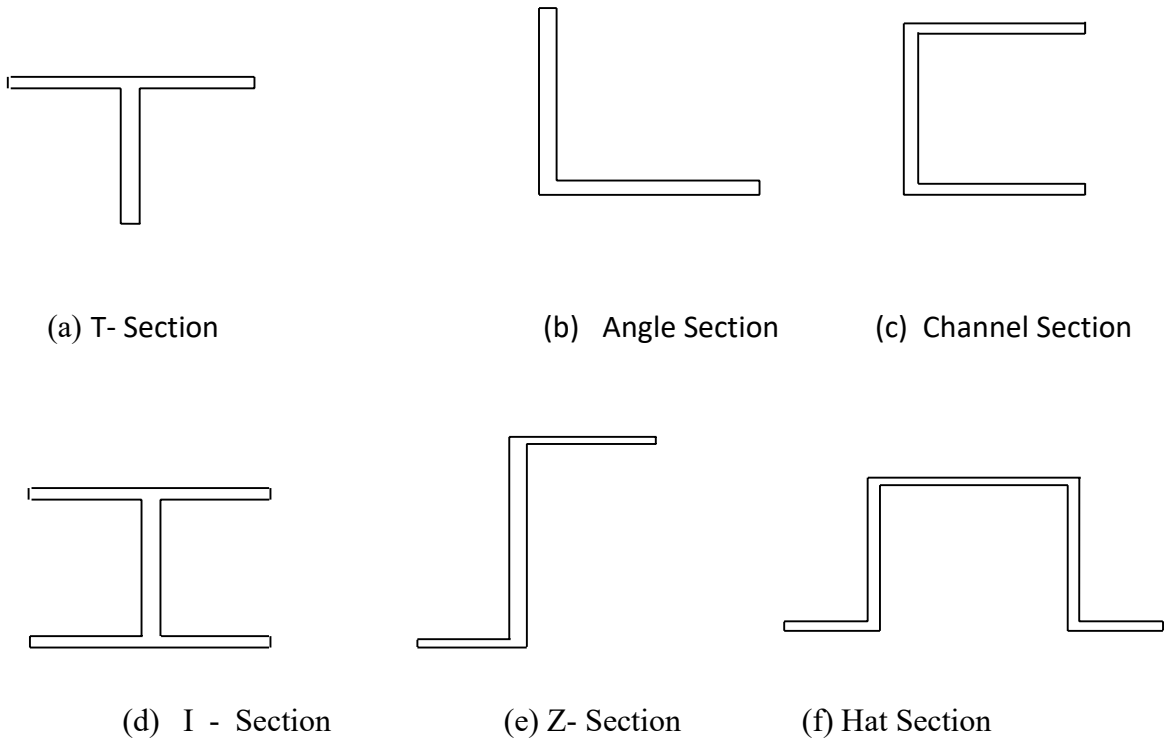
Examples of Thin-Walled Open Cross-Sections
